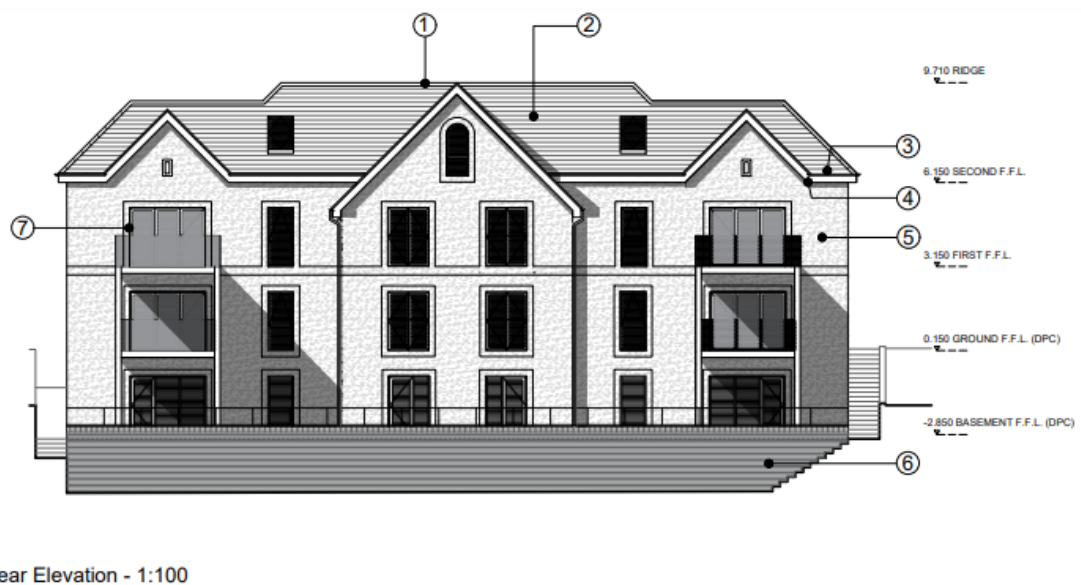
Proposed rear elevation facing onto Godfrey Road.
